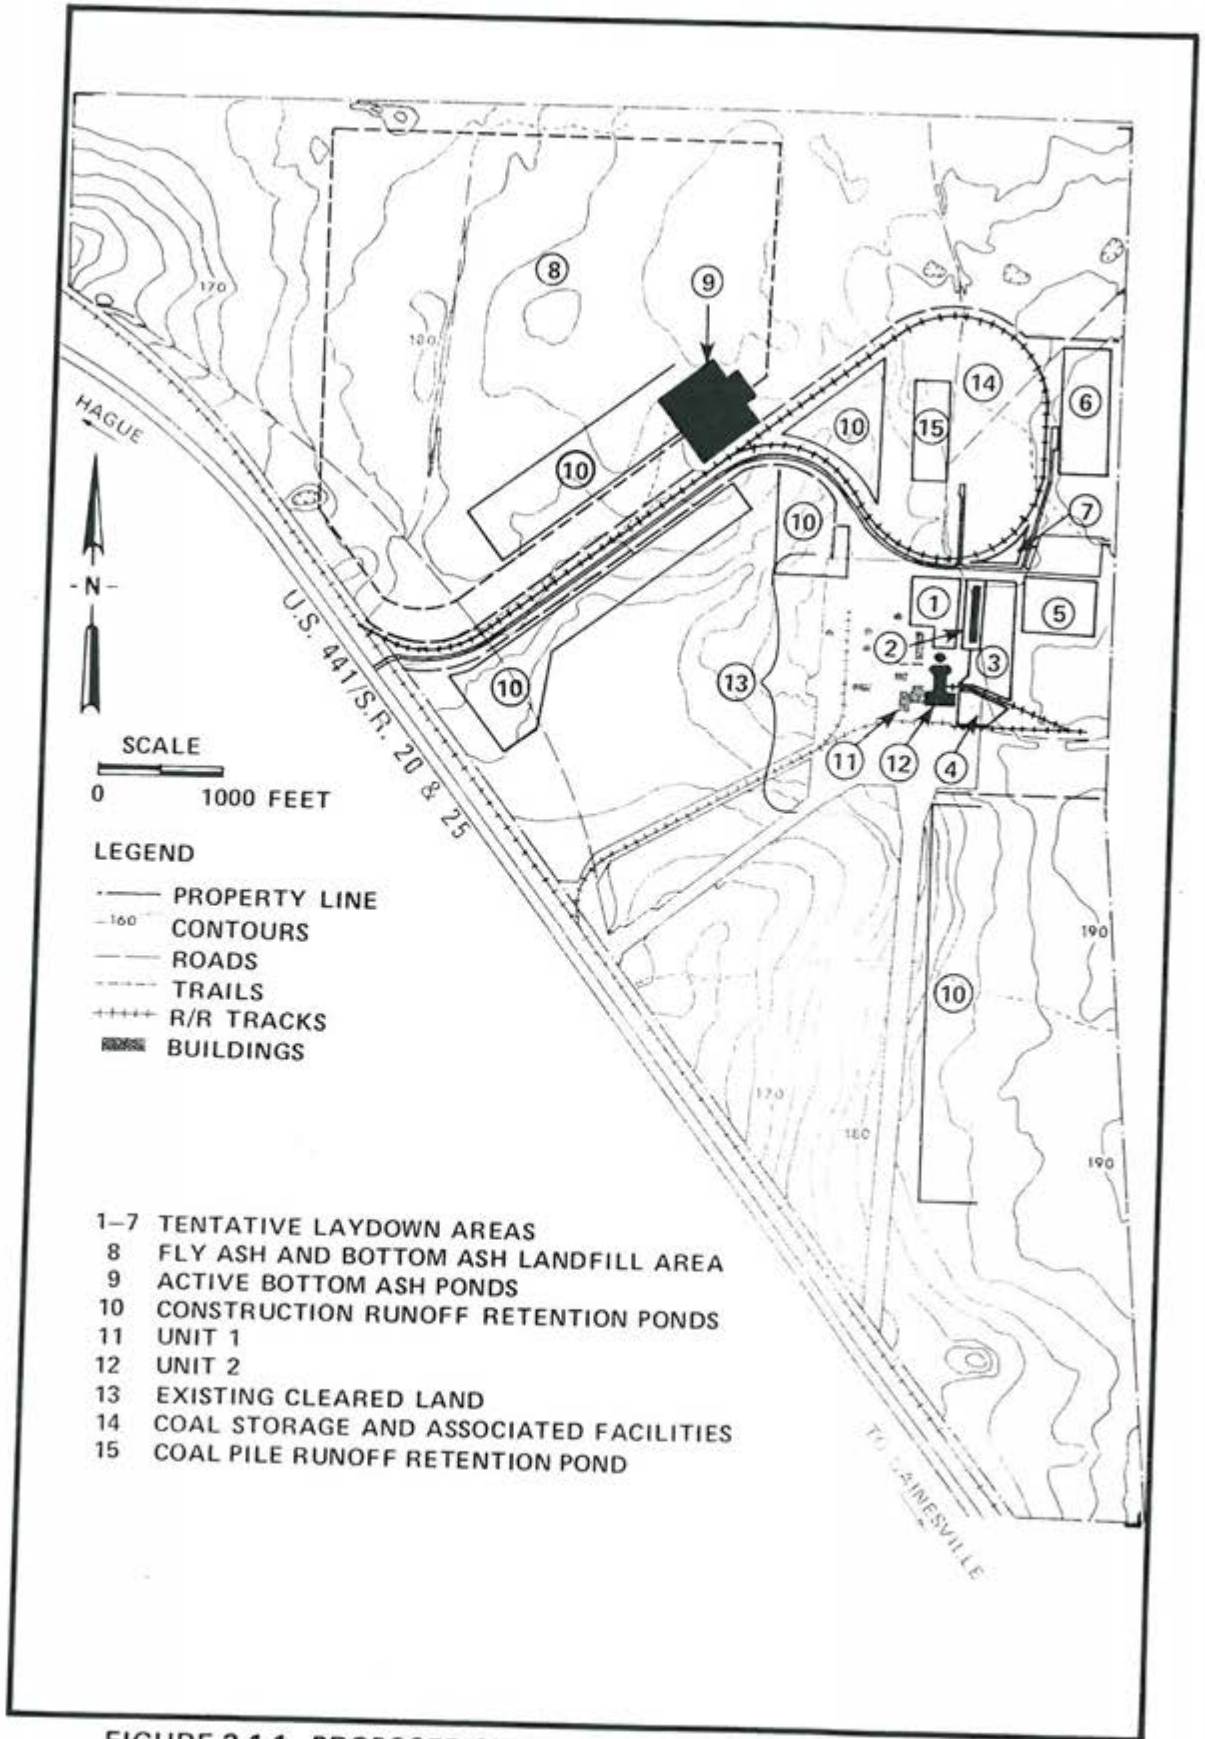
PROPOSED SITE PLAN OF THE DEERHAVEN SITE.
